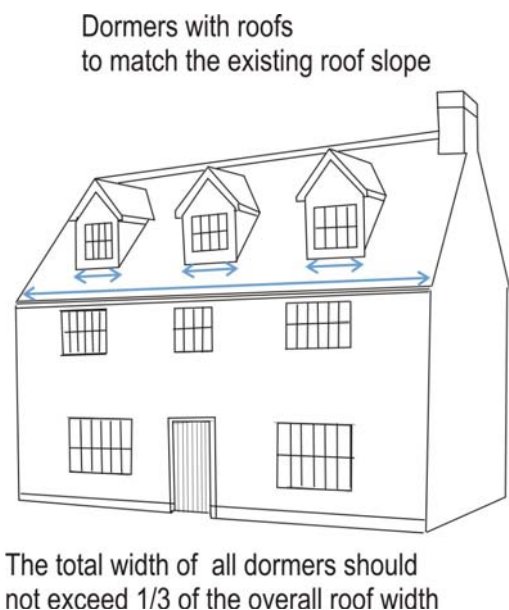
& b: Design principles to ensure dormers are in proportion with the roof.
